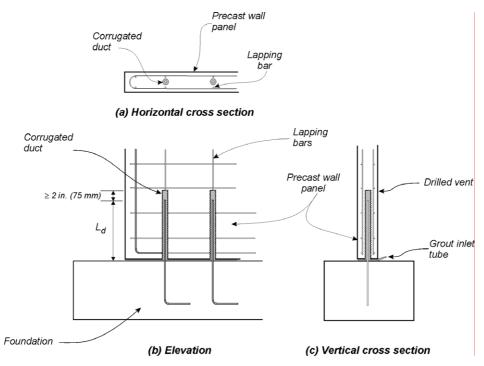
Wall-foundation beam connection through grouted ducting
